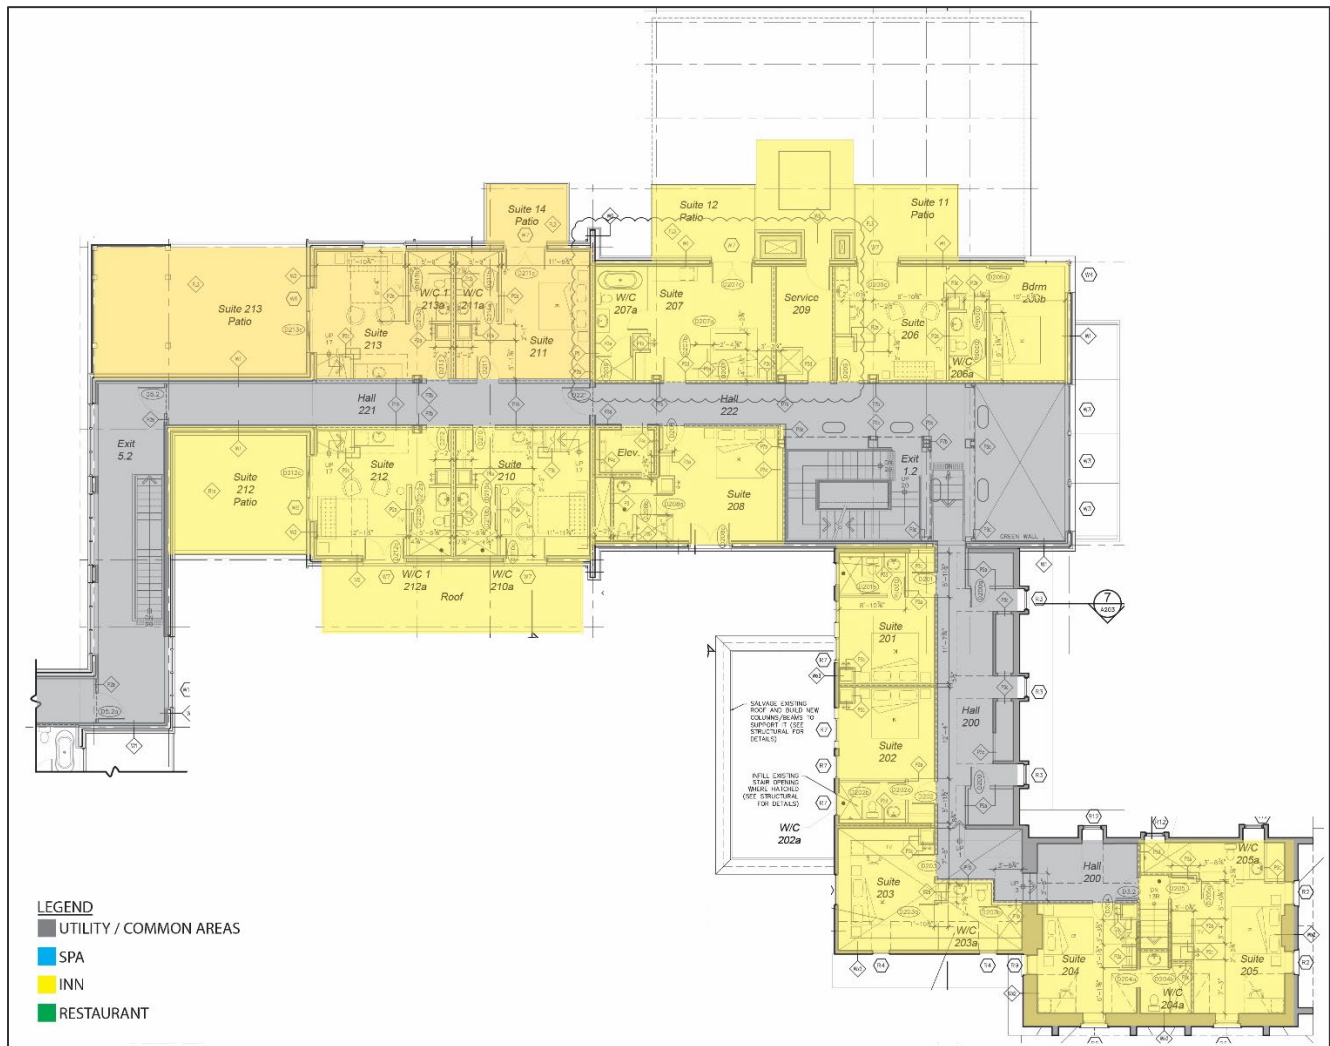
Floor Plans (source: Shoalts and Zaback Architects)
